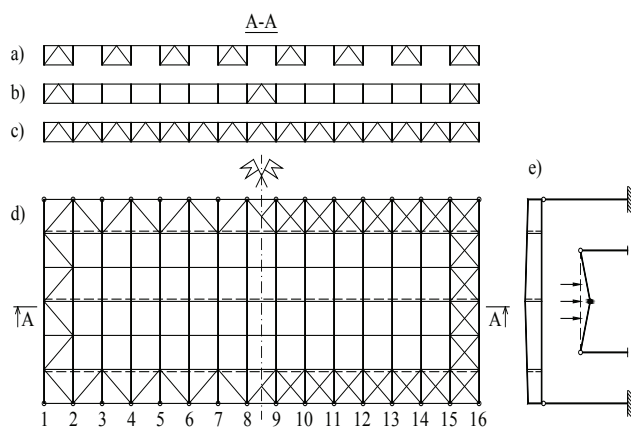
Girder bracings: a) in pairs, b) key lateral, c) continuous lateral, d) slope, e) spacing on the girder + beam failure mechanism
